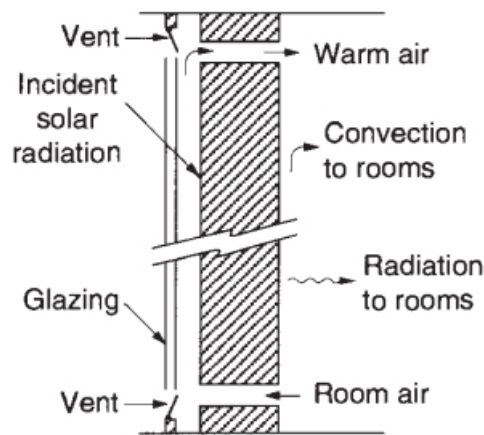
Section of a storage wall with glazing and energy-absorbing surface on one surface [32]
